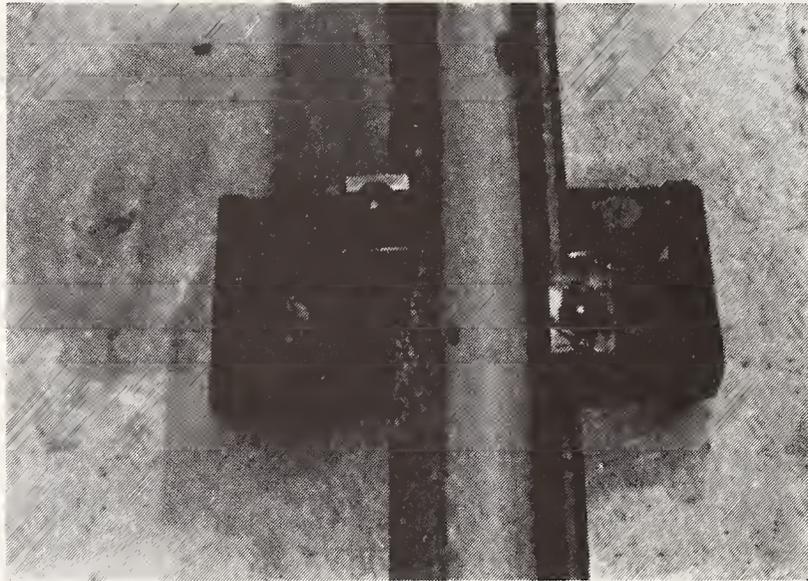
BART SUBWAY INSTALLATION OF LANDIS FASTENER
